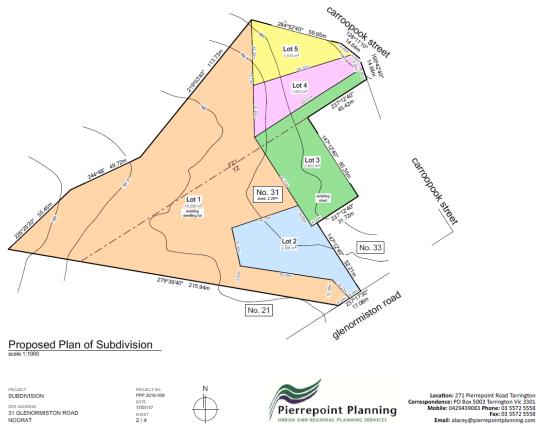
Proposed 5 Lot Subdivision, 31 Glenormiston Road, Noorat
